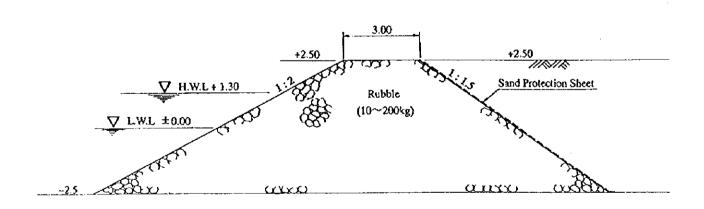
(2) Typical Cross Section of Revetment 2 (Rubble)
